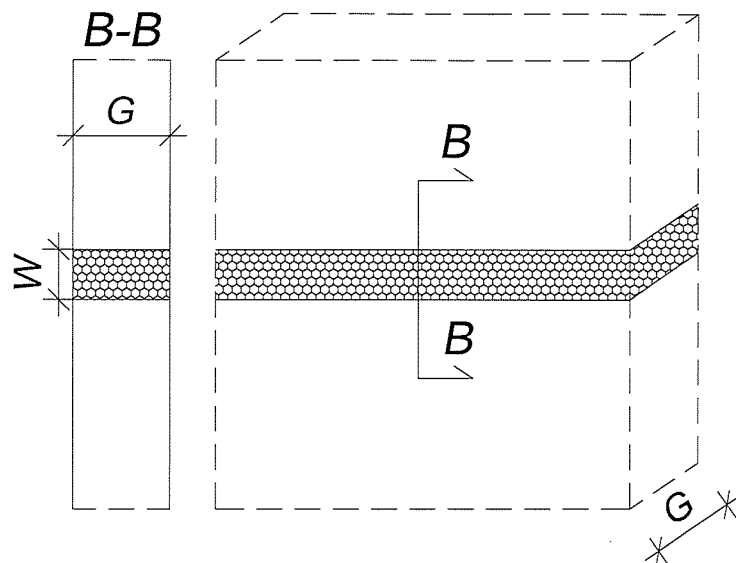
View and cross-section of the horizontal linear joint seal in wall
